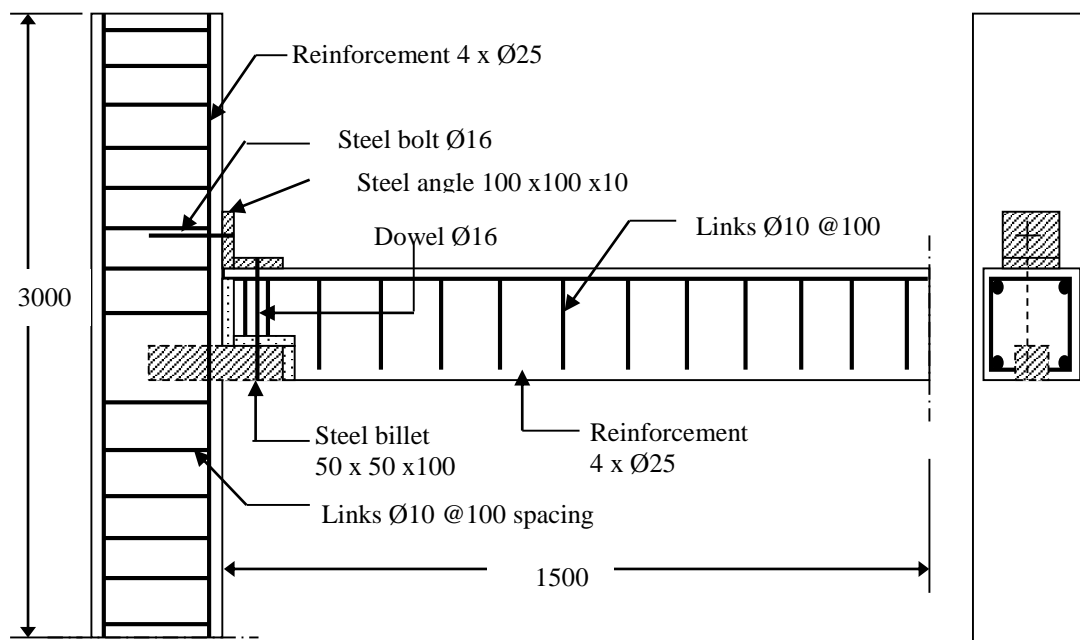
A layout of precast billet connection model (*dimension in mm*)
